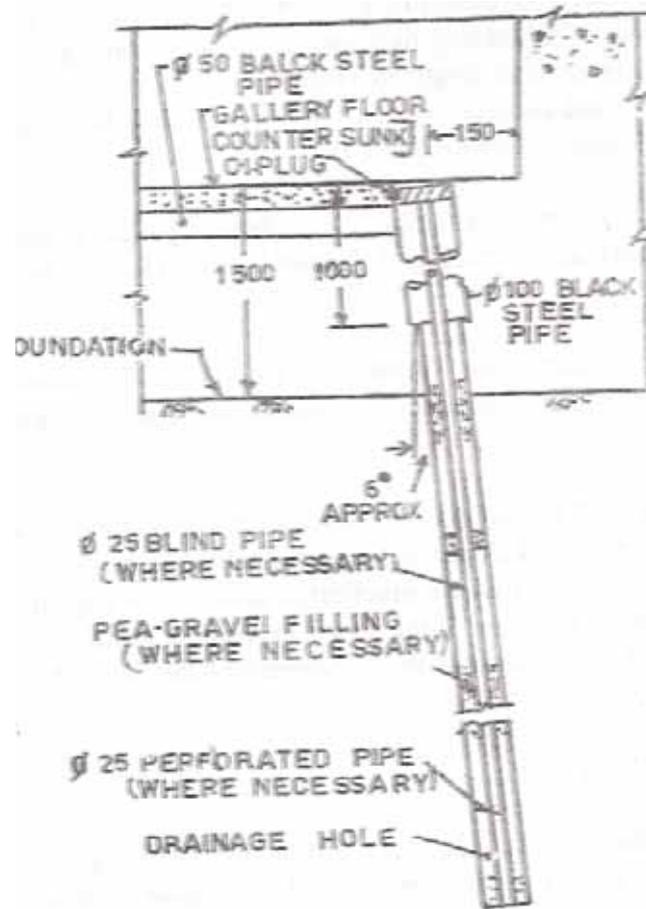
B. Foundation Drainage Pipe (In Soft Foundation)
